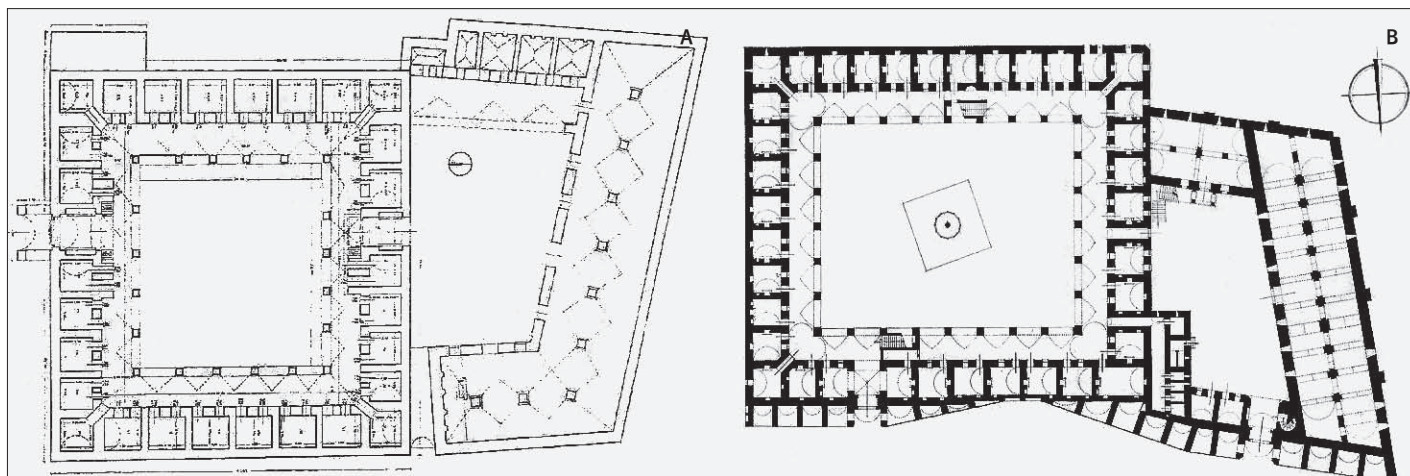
PLANS OF THE KHANS: A – SKOPJE KURŞUNLU KHAN, B – EDİRNE RÜSTEMPAŞA CARAVANSERAI
